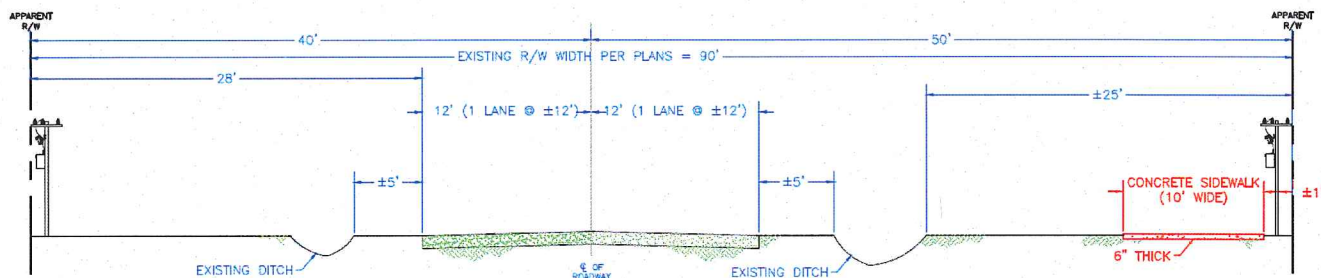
LA 1040 – Klein Drive to Old Baton Rouge Highway – Proposed Typical Section Facing East
